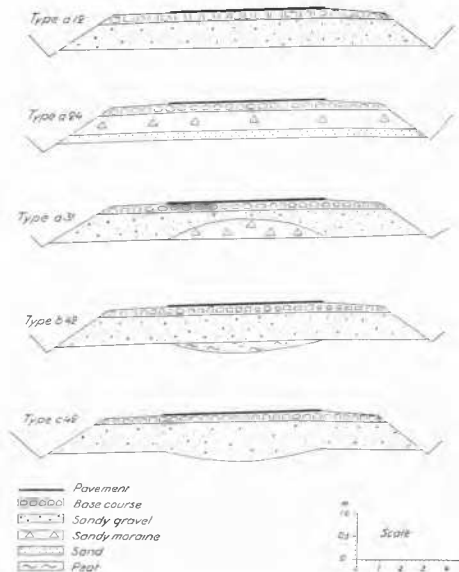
Road cross sections with different types of sub-bases tested on the test road Öjebyn in 1957.
